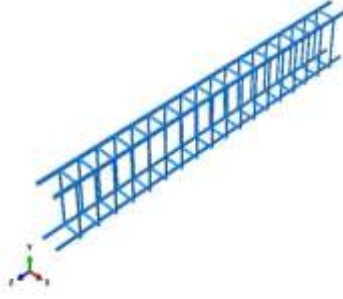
Reinforcement and Loop Stirrups 3D modeling.
